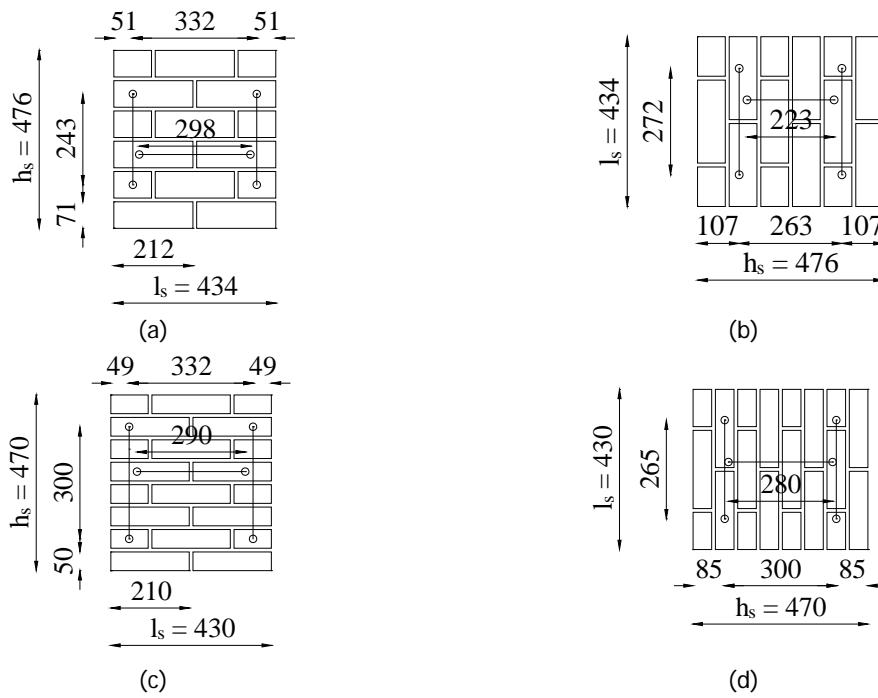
Position of the LVDTs during the compression test on masonry: (a)-(b) calcium silicate masonry specimens; (c)-(d) clay masonry specimens.
